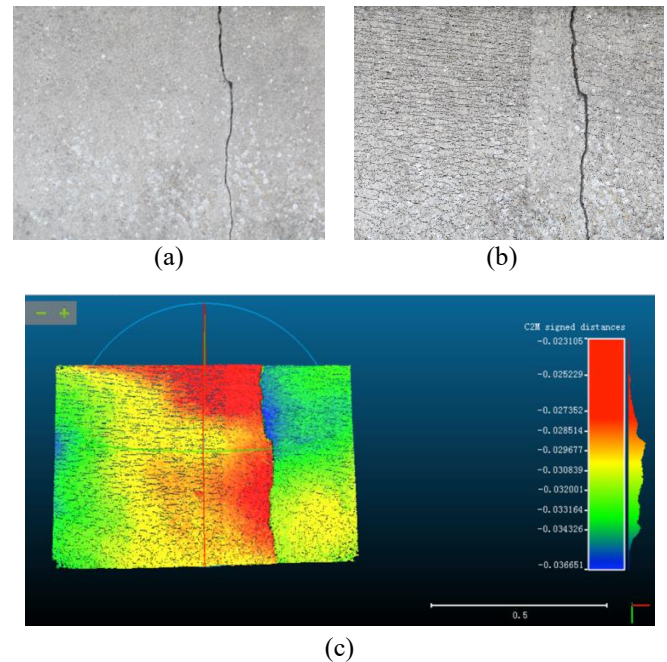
Damage detection on concrete surfaces: (a) Original image, (b) reconstructed point cloud, (c) digital elevation model (DEM) for damage identification.
